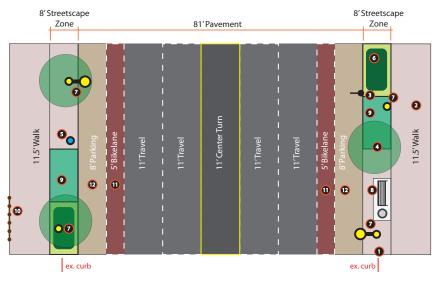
East Jefferson 1A Type Plan-Section: Full Level of Development
